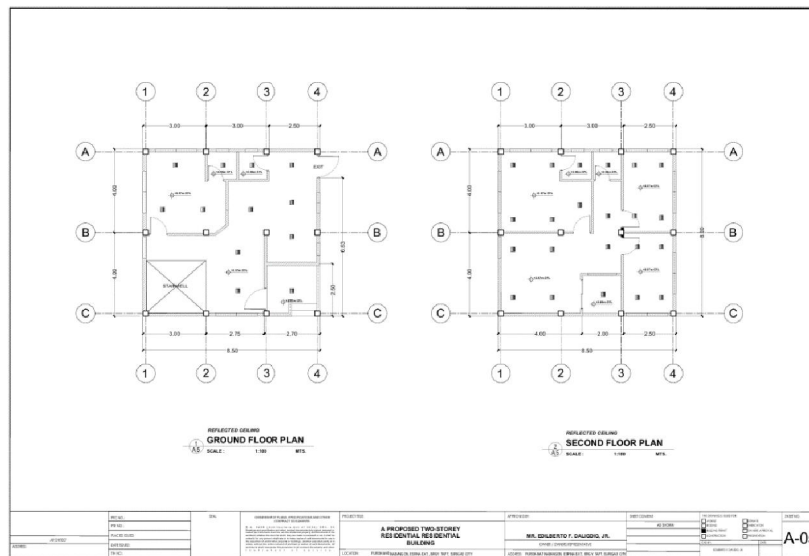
Two-Storey A05 – Ground Floor and Second Floor Plan
